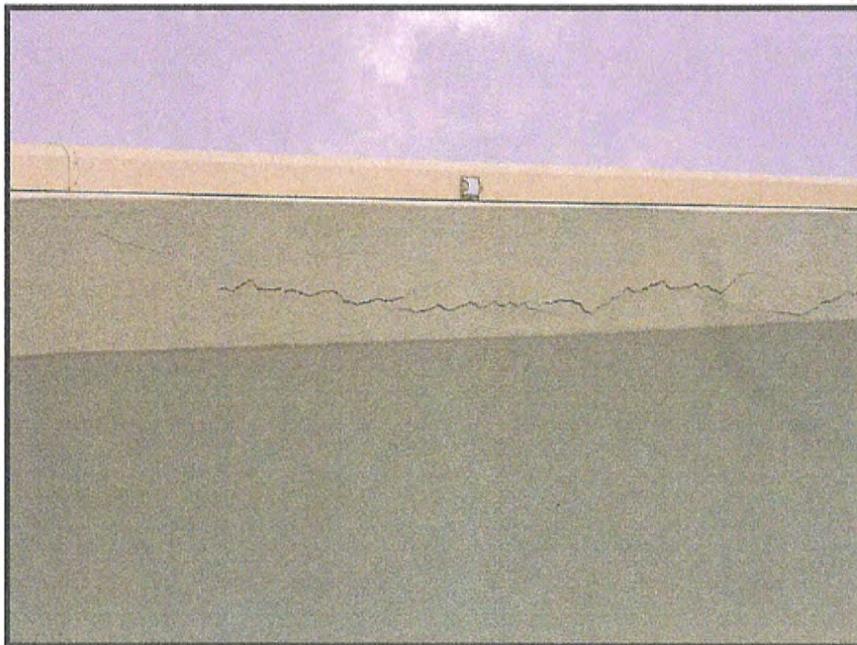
Delamination along the bottom face of balcony edge beam on the West side of building.
